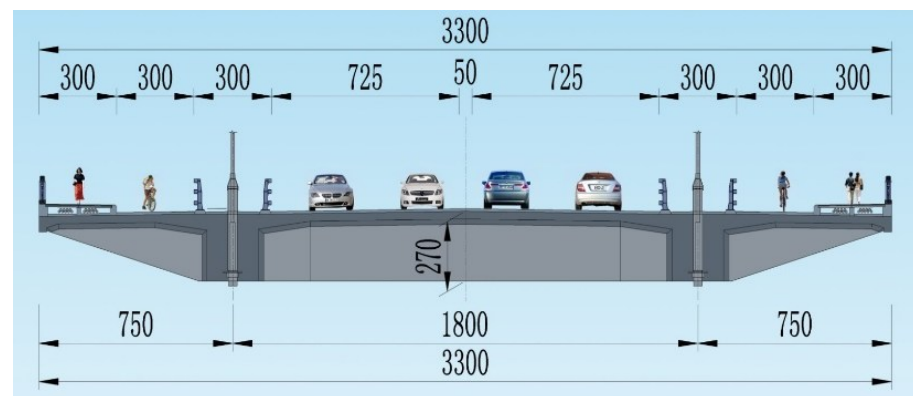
Schematic diagram of the cross-sectional layout of the standard section of the main bridge (Unit: cm)
